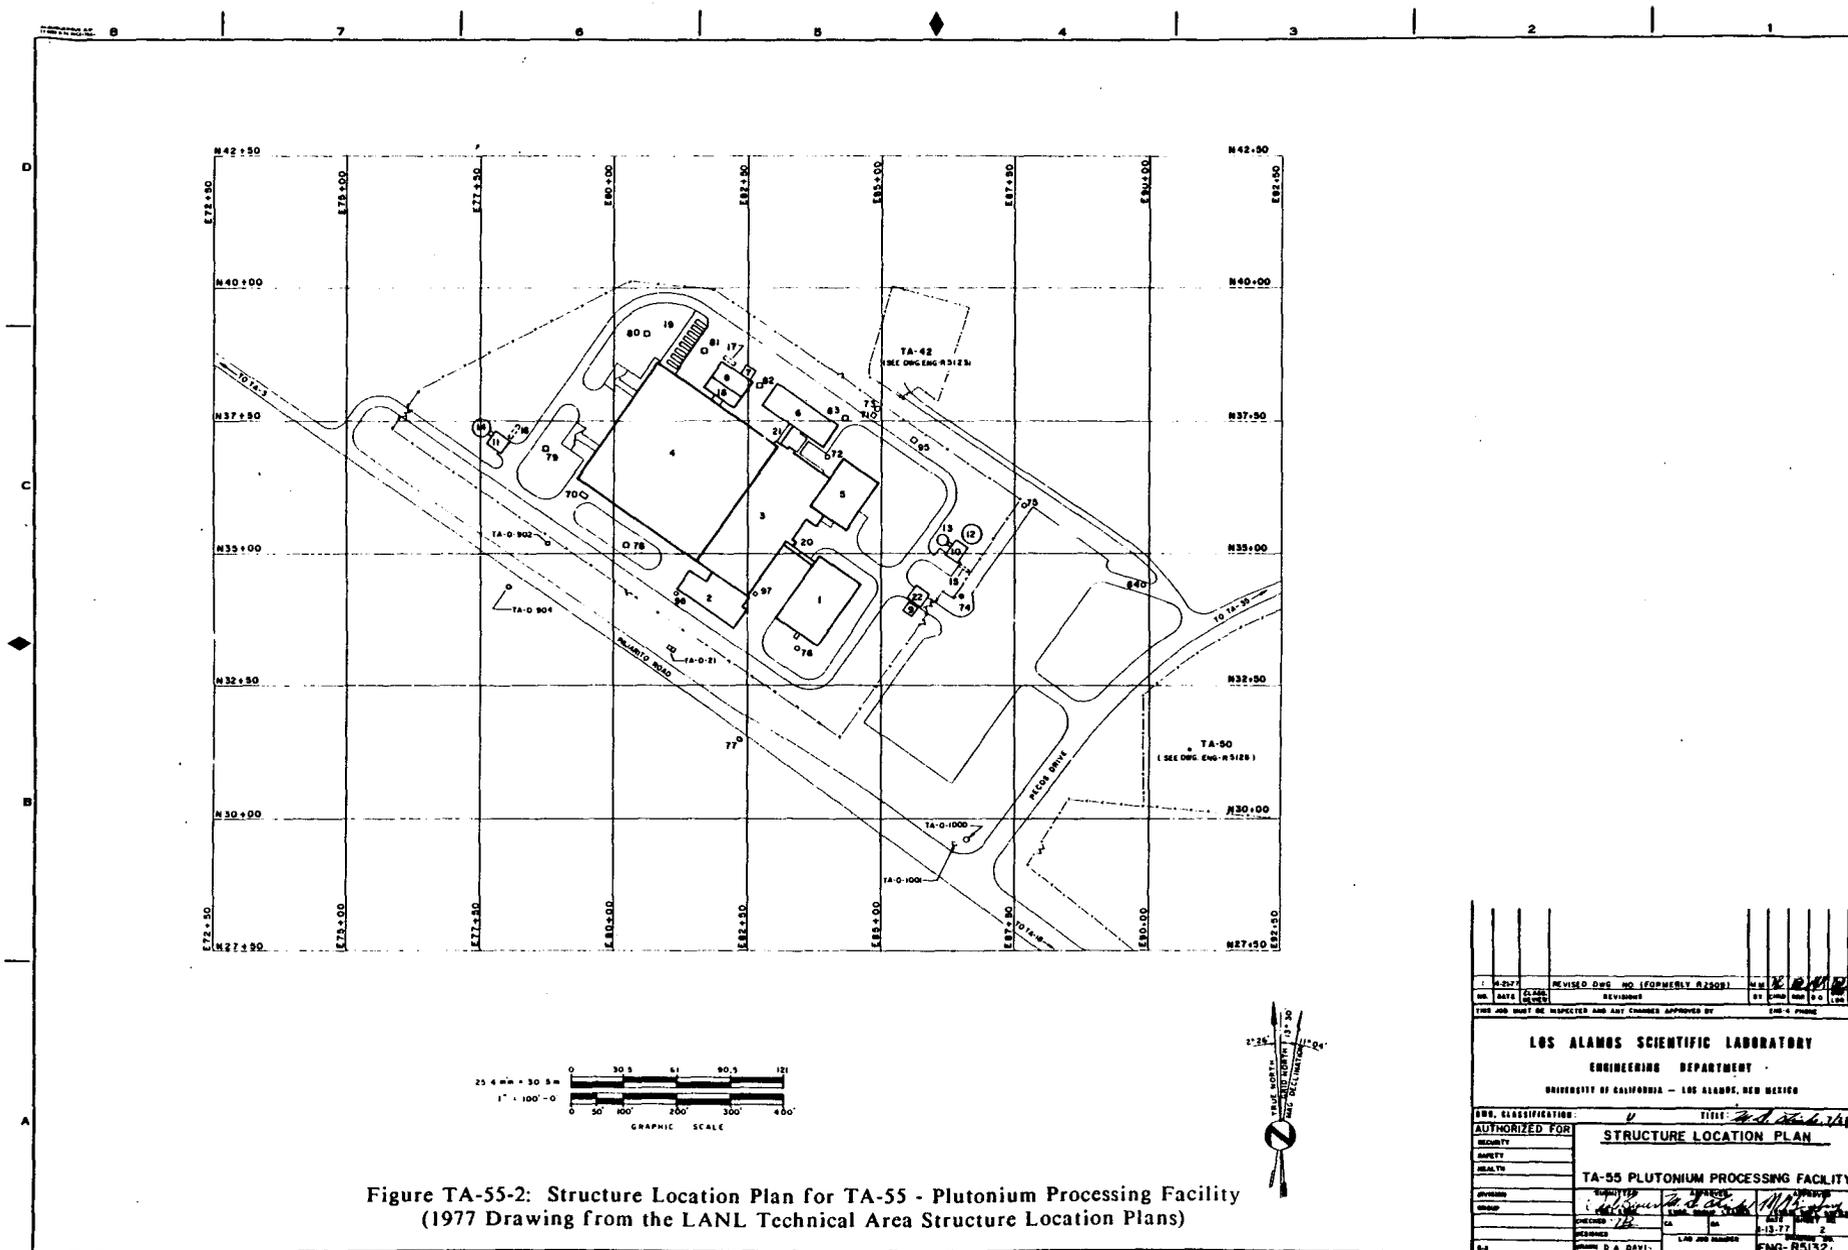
Structure Location Plan for TA-55 - Plutonium Processing Facility
